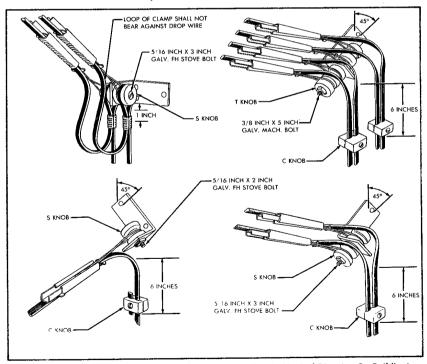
First Attachment, House Bracket (Drop Wire Run in Vertical Direction On Building)
